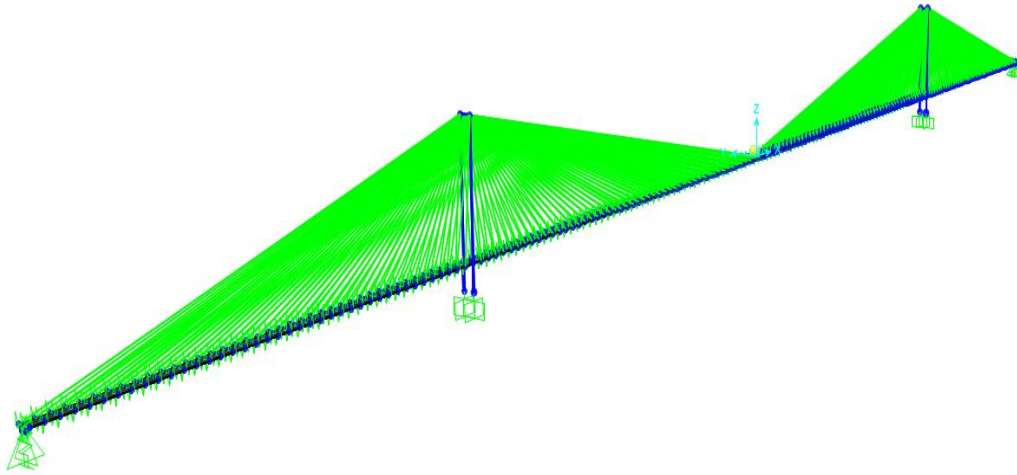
Cable-Stayed Bridge Modeled in CSI-Bridge Software
